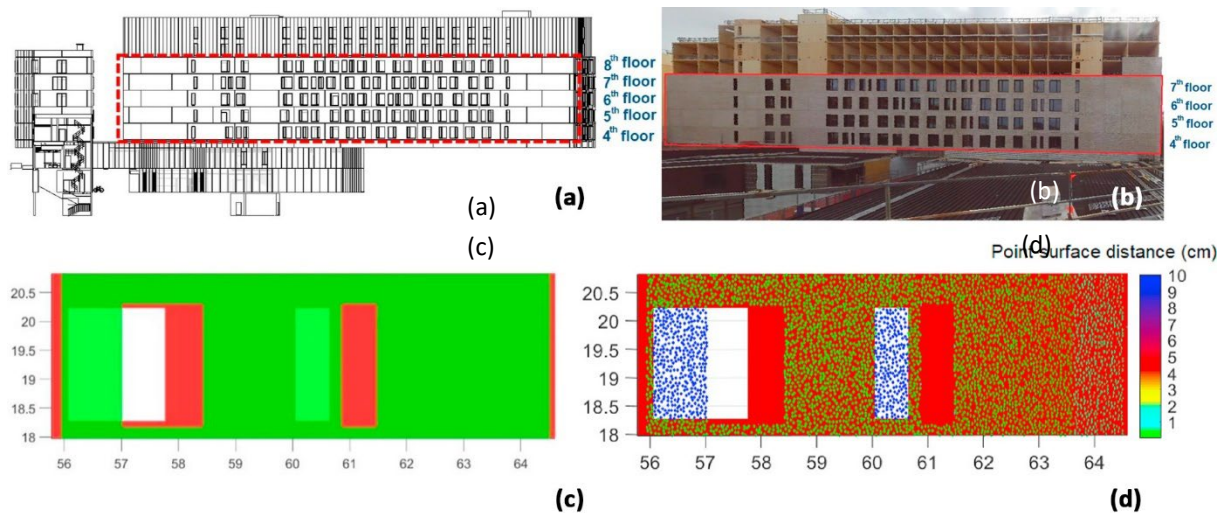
(a) Building model at design stage, (b) Building at construction stage and façade panels shown in red frame, (c) Model (green) and real (red) building panel overlay, (d) Model building dense points colored according to point-surface distances to the real building surface (Tran et al., 2021)
